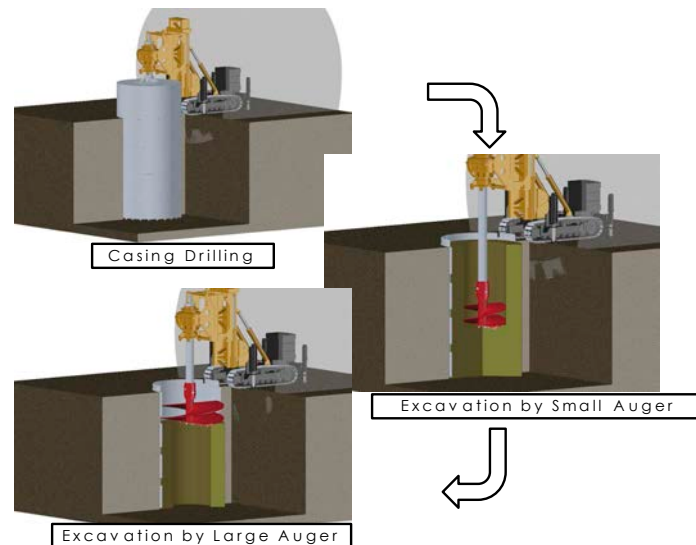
Procedure drilling test pit using drilling machine for large diameter
